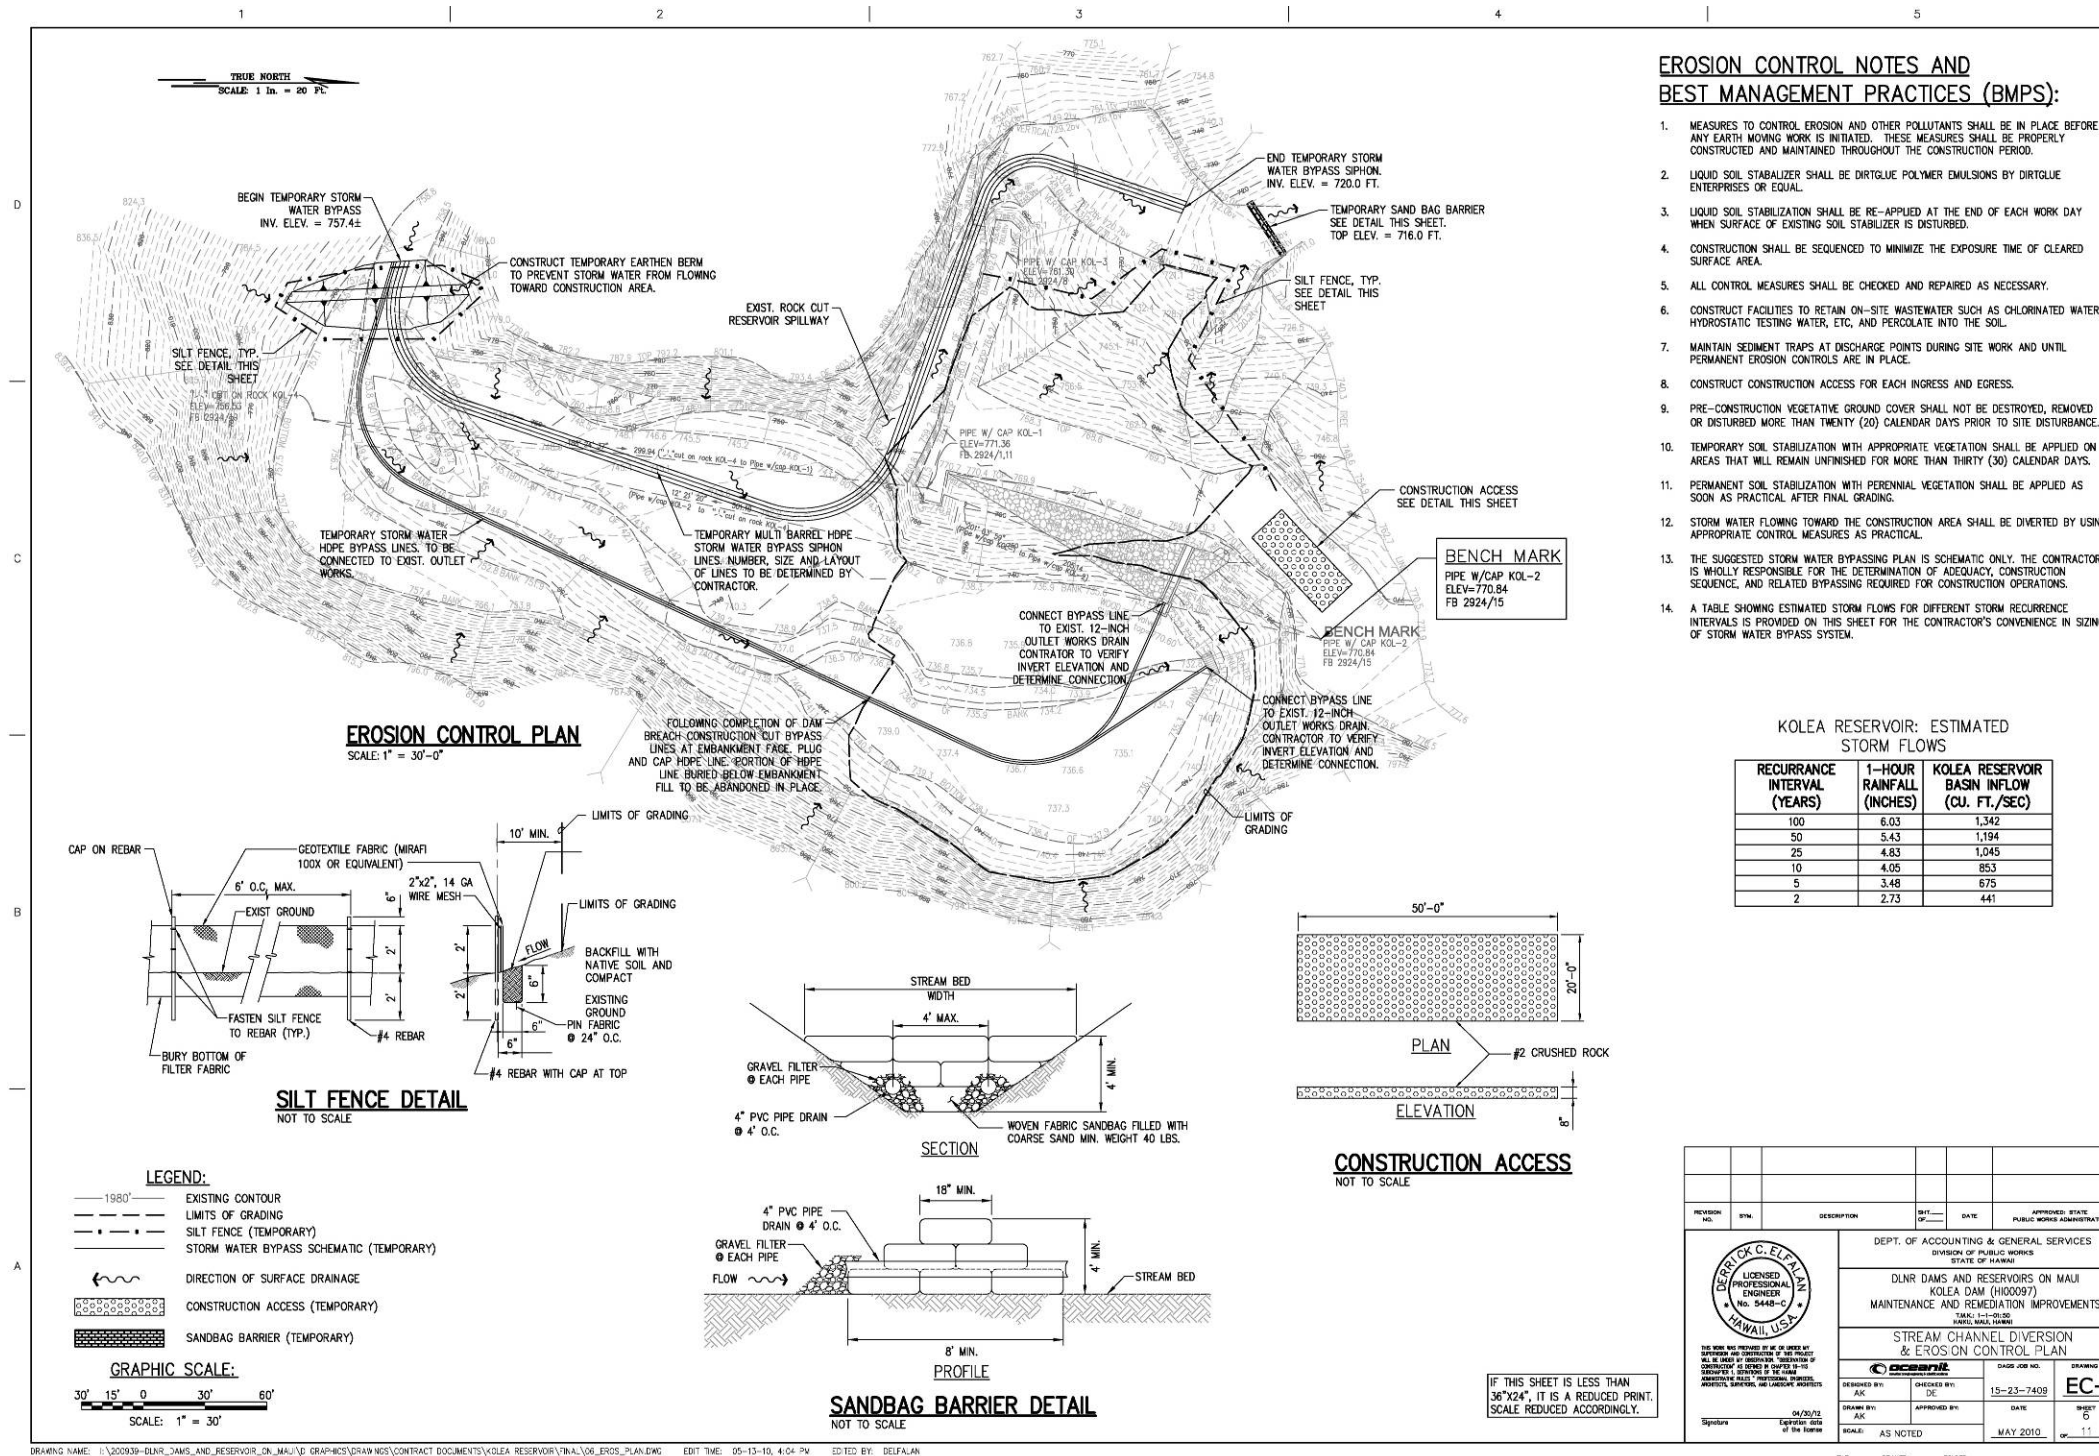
Proposed Project Alternative: Removal of Dam – Erosion Control Plan
